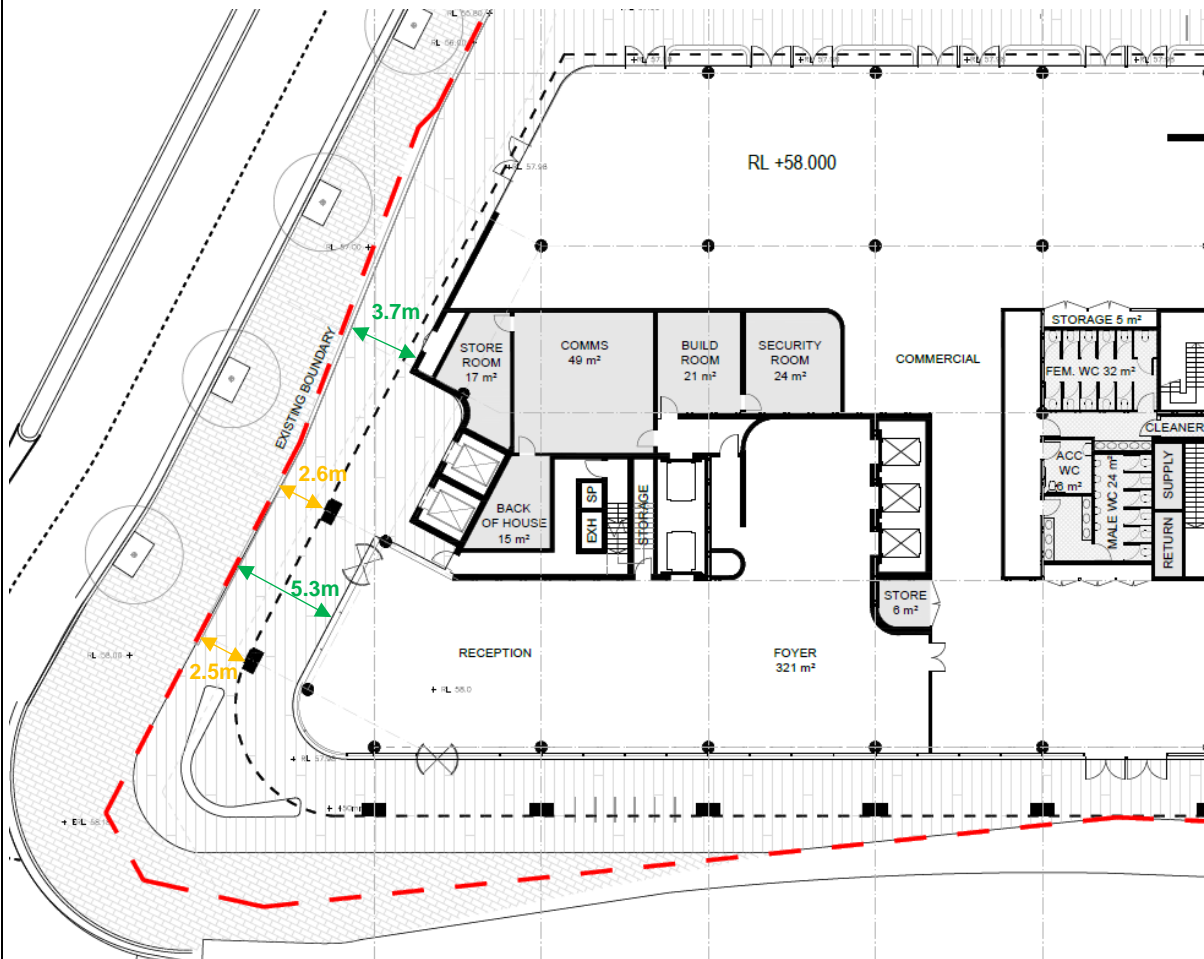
Extract from ground floor plans illustrating setbacks from Parkes Street
